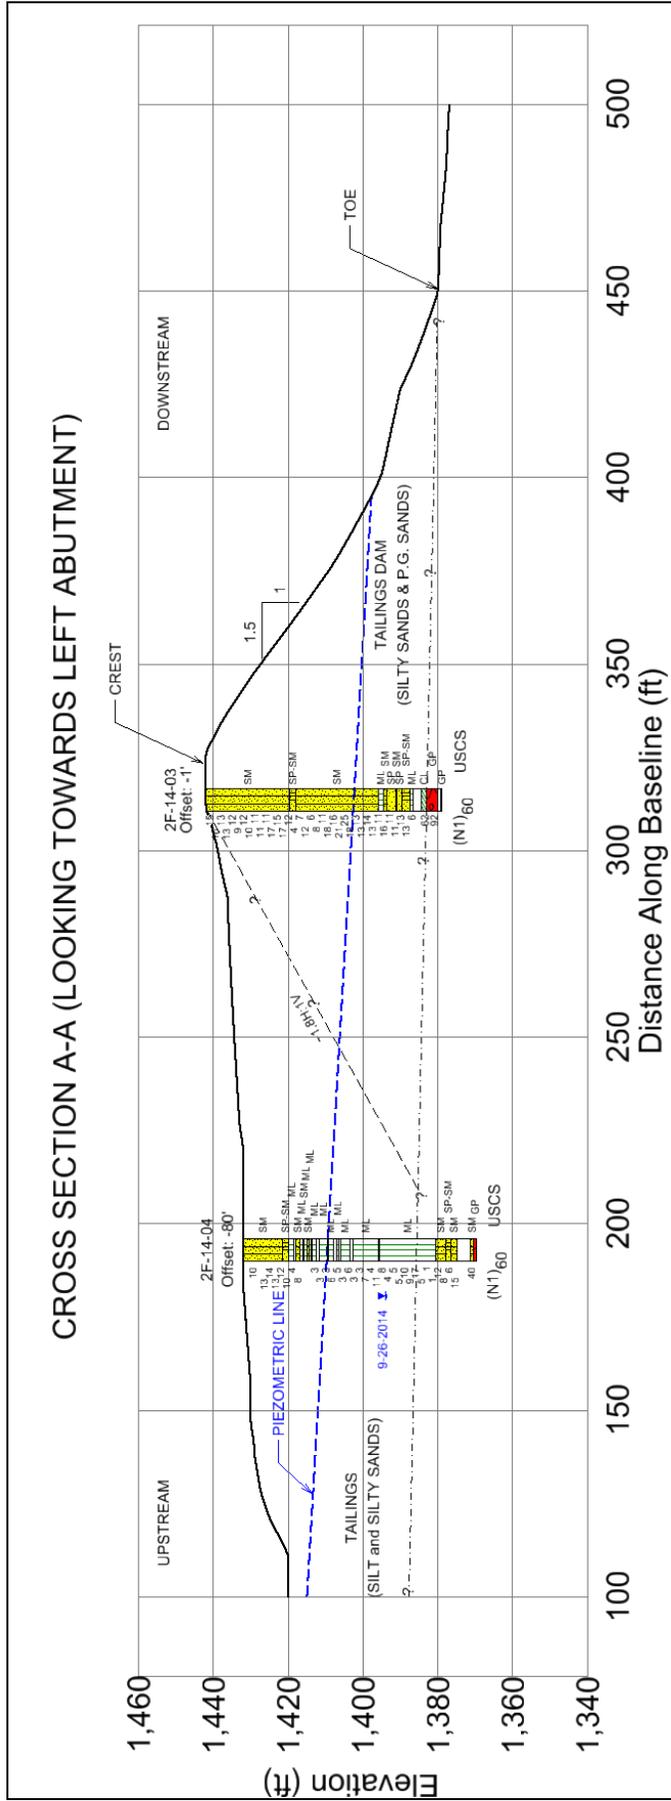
Earth Tailings Storage Dam - Cross Section
